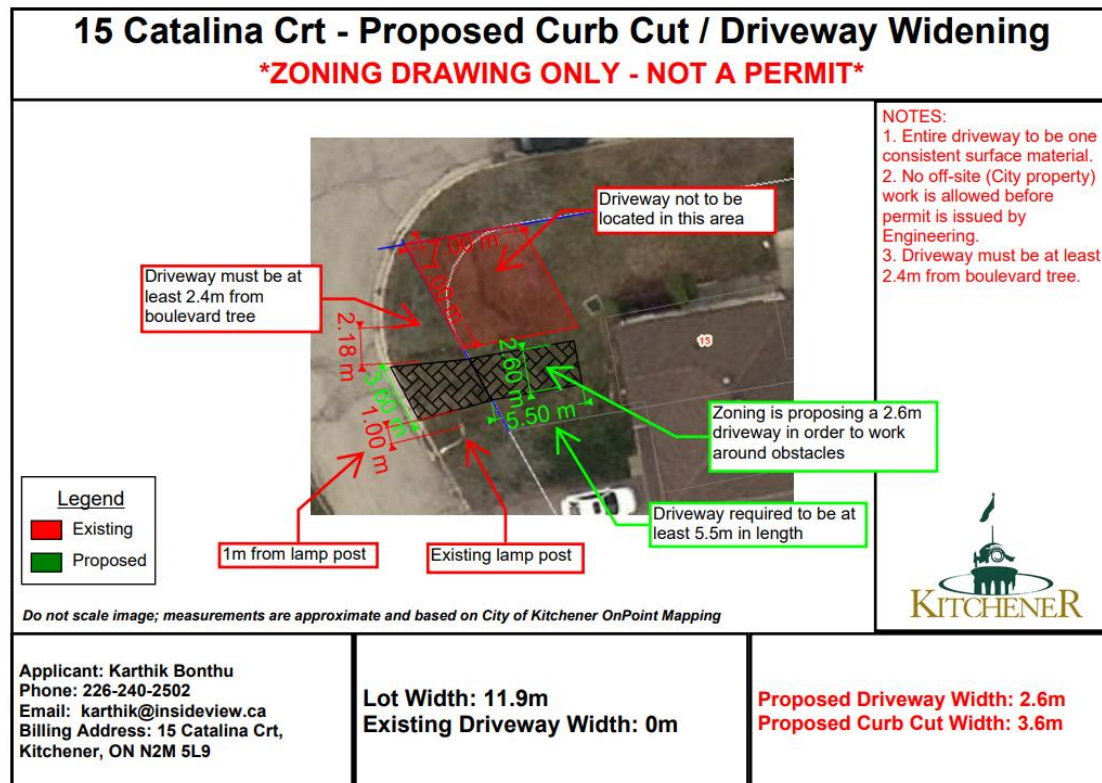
Figure D – Curb Cutting/Driveway Widening Drawing For Permit
